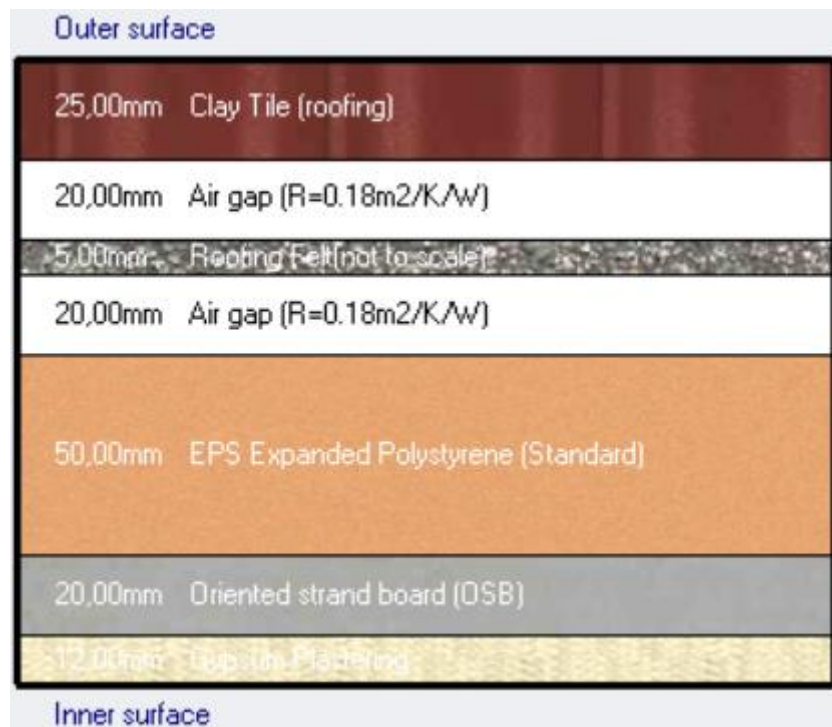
Detail of the roof of the terraced house in DesignBuilder (low insulation)
